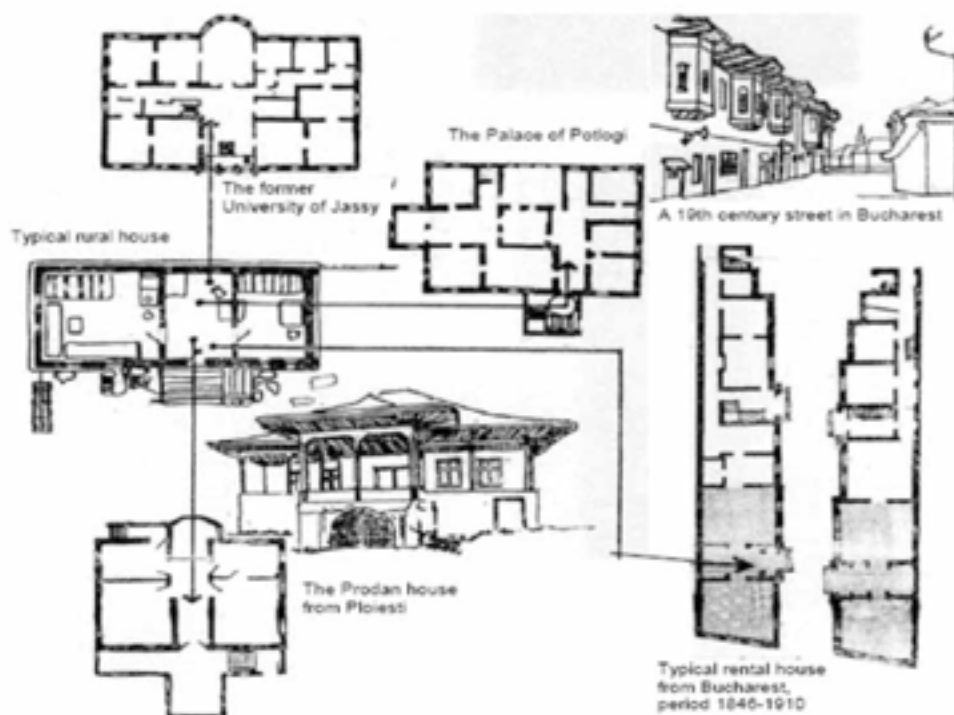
Transfer of traditional Romanian folk house plan into the plan of aristocratic city houses and of palaces. (Caffe M., 1987b).
